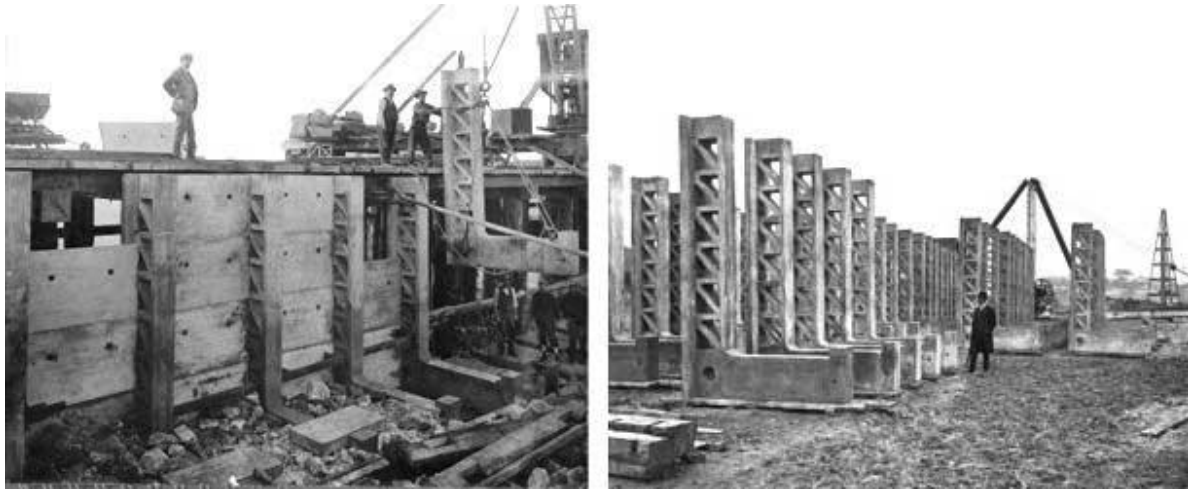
'Rat proof' Monier pre-cast Concrete Seawall. Photos from www.visitsydneyaustralia.com.au
